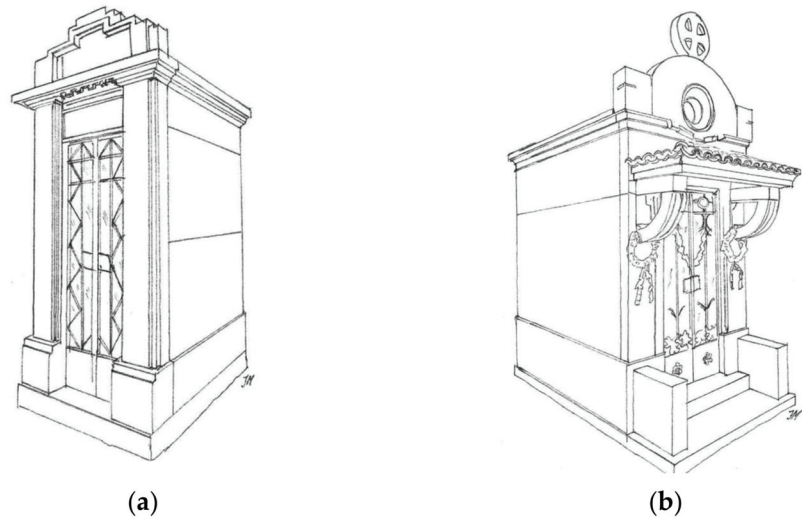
Examples of architectural styles of the narrow mausoleums: (a) Art Deco and (b) Portuguese House.
